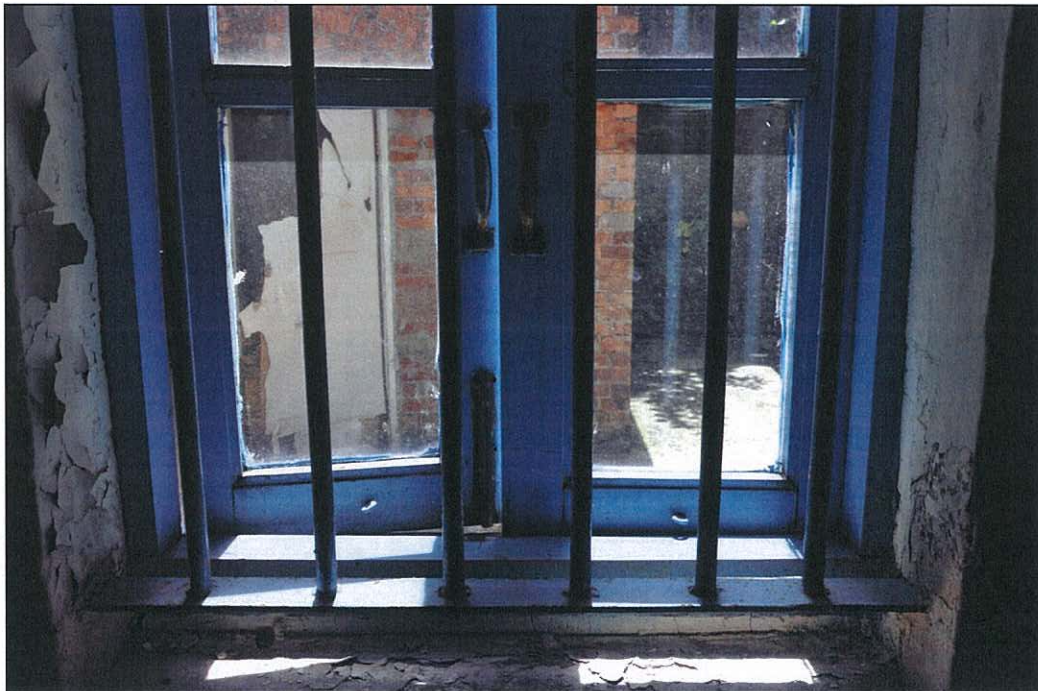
Rear room 4, pull handle and lower vertical bolt of timber casement window
